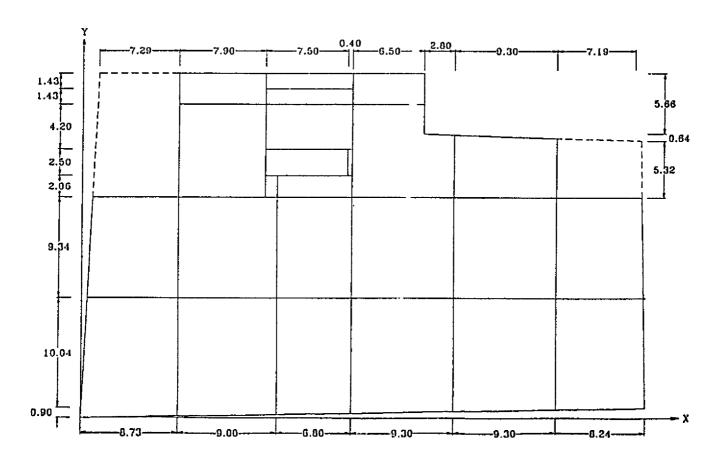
Plan of levels N1 to PB, axis, columns and walls.
